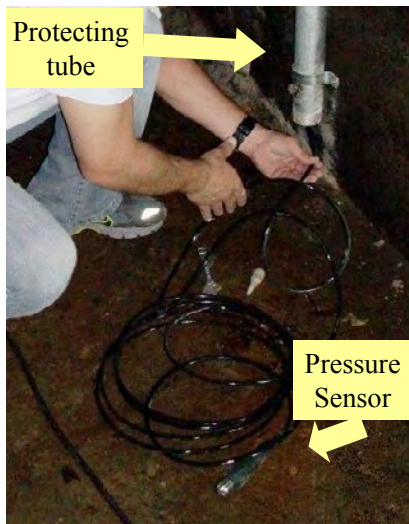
Installation of a pressure sensor in a drainage channel.
